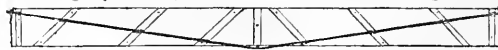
TRUSS BEAM, 20 FEET LONG.
